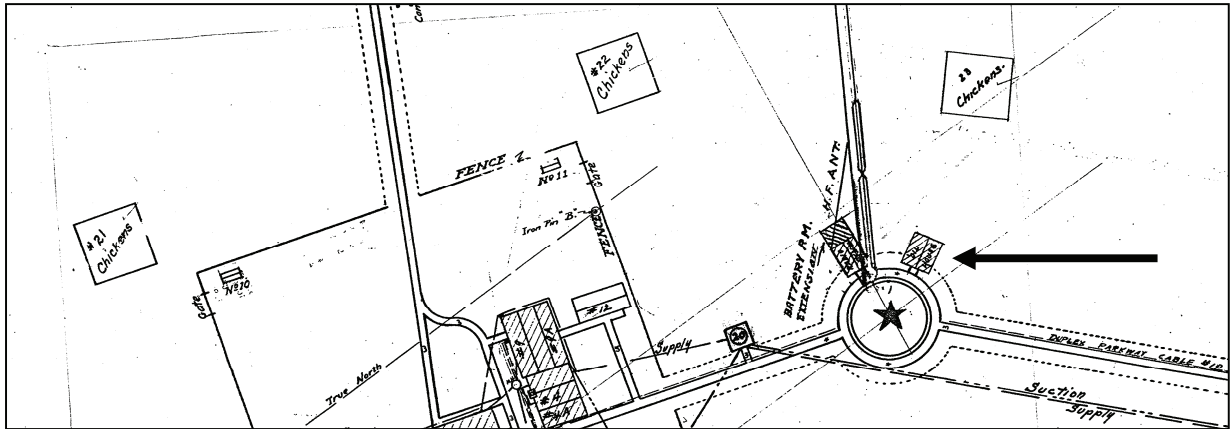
Close-up of 1943 Station site plan showing the new Oil Storage Building adjacent to Lighthouse and original Oil House.
